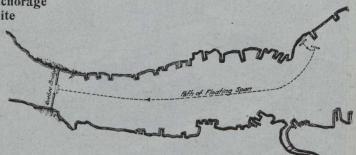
Path of Floating Span from Erection Site to Bridge
